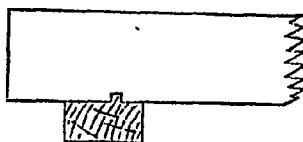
shows the end of a tie beam cogged on to a wall-plate: the tie beam is in elevation, the wall-plate in cross section.
